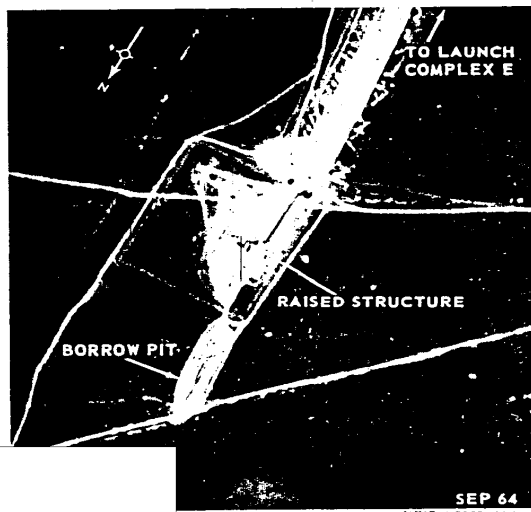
NEW CONSTRUCTION NORTH OF LAUNCH COMPLEX E, KAPUSTIN YAR.
